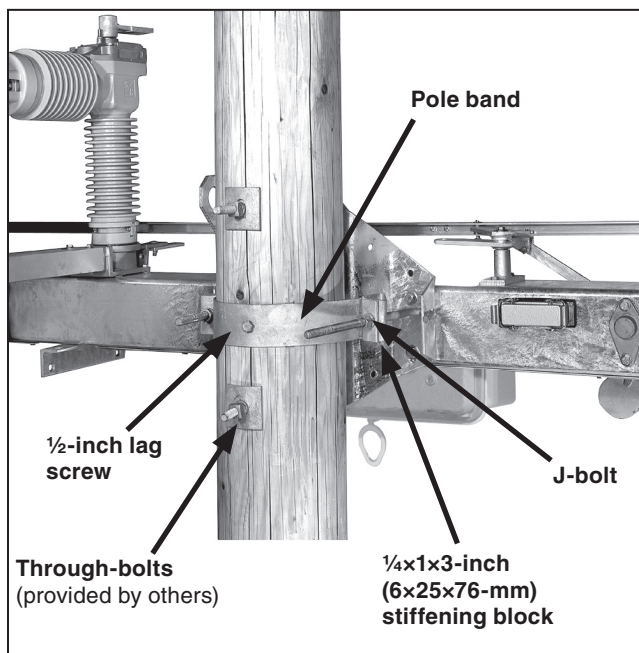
Securing pole band to mounting bracket (upright mounting configuration shown).
